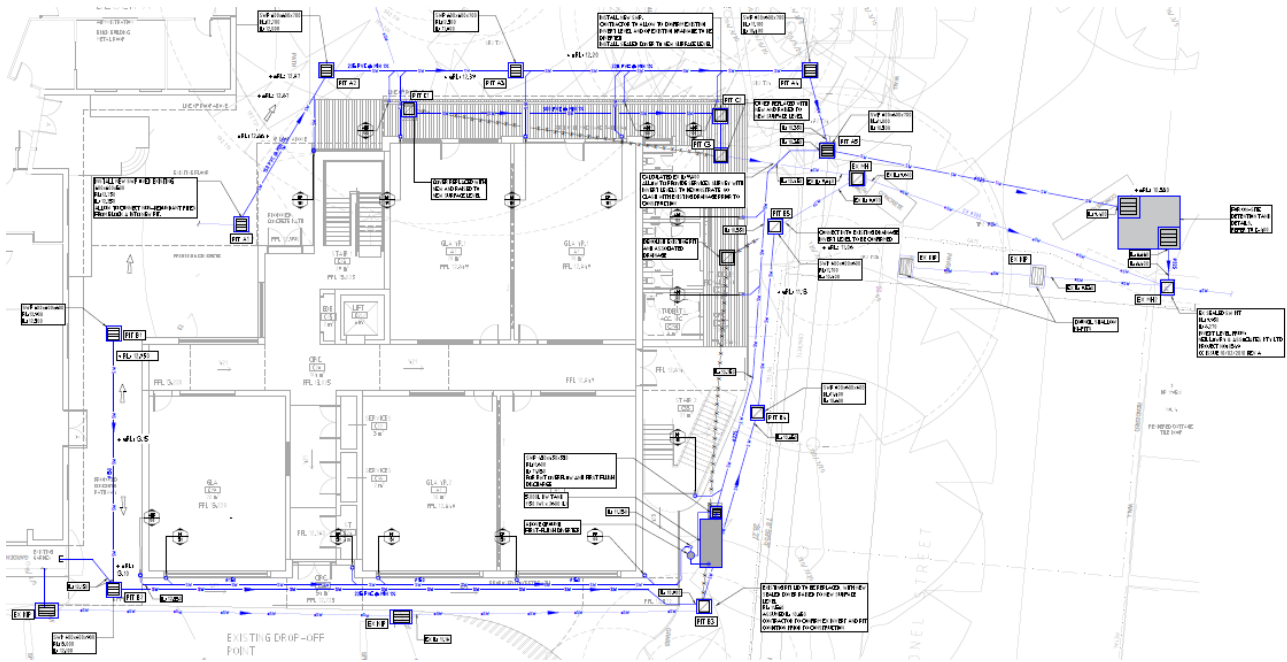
Extract of Stormwater Drainage Plan(Source: AYCE)
